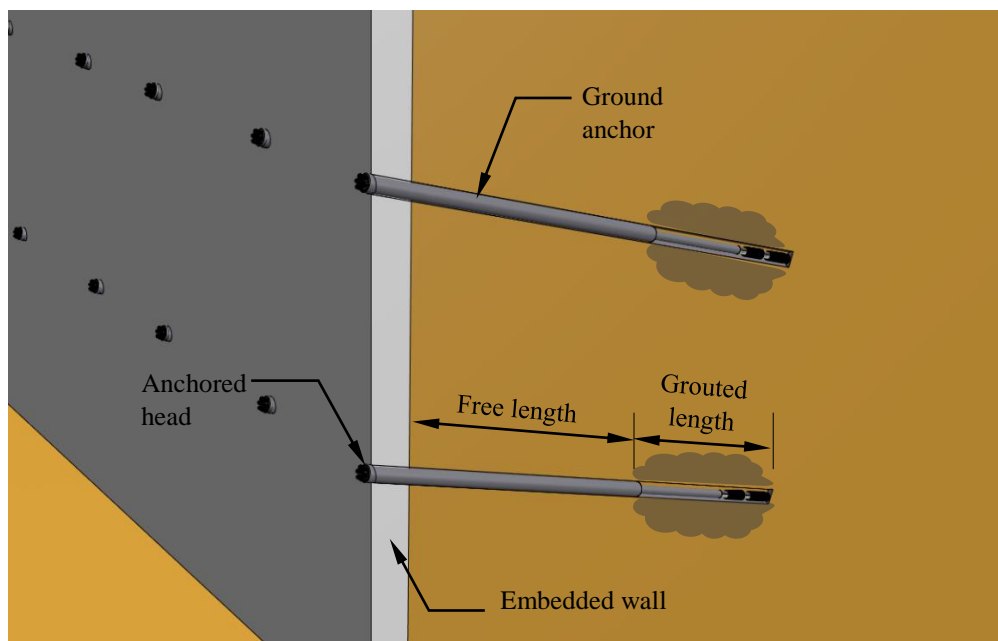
Tied-back Wall Support System Using Ground Anchors
